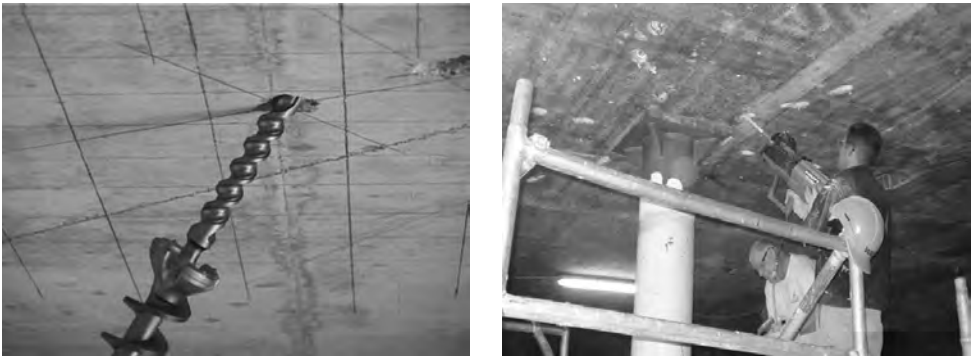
Enlargement of the hole for anchor heads and filling the holes with adhesive mortar
